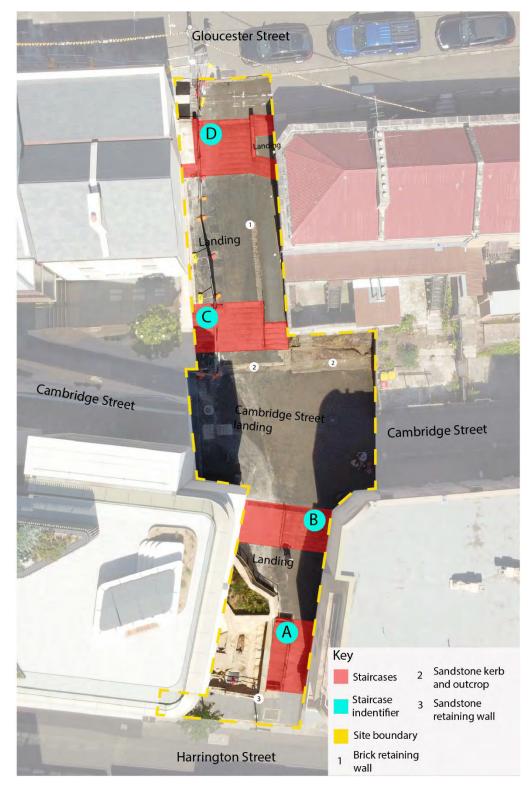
Aerial of Cumberland Place and Steps with elements and adjacent streets labelled.
